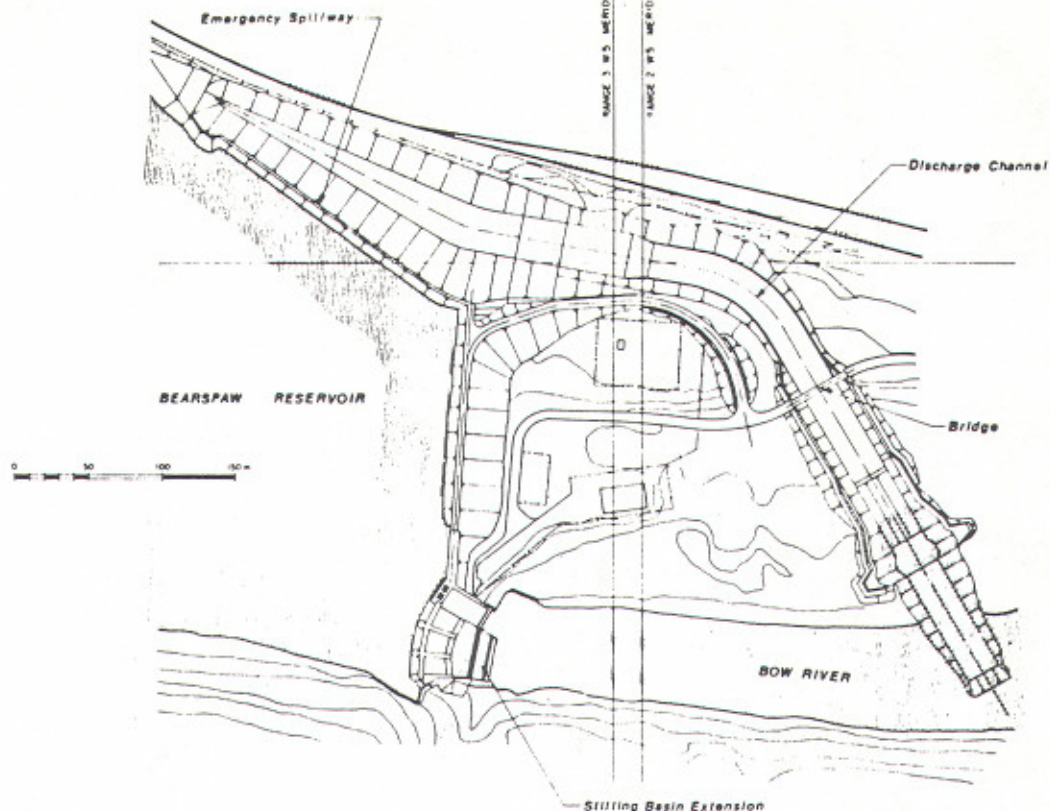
BEARSPAW - GENERAL LAYOUT
